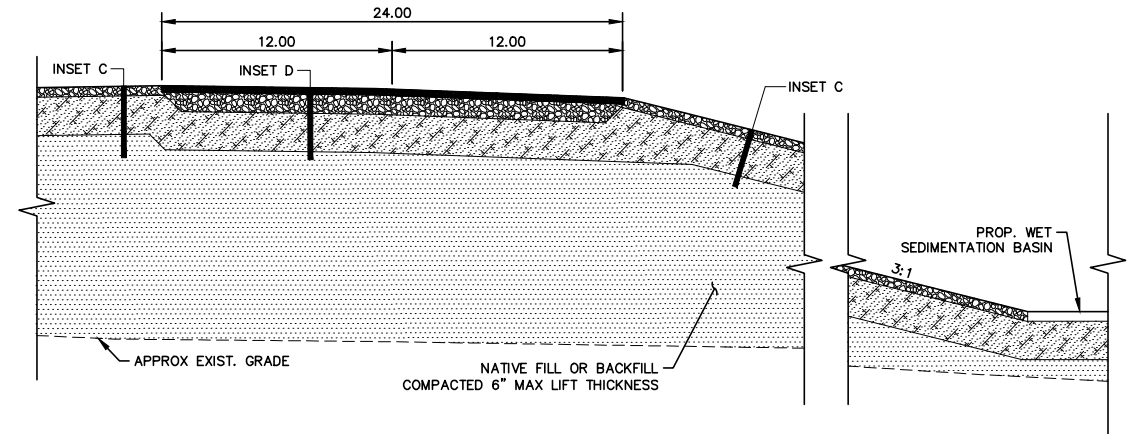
TYPICAL TRANSITION BETWEEN CRUSHED ROCK AND GRANULAR PAVEMENT
